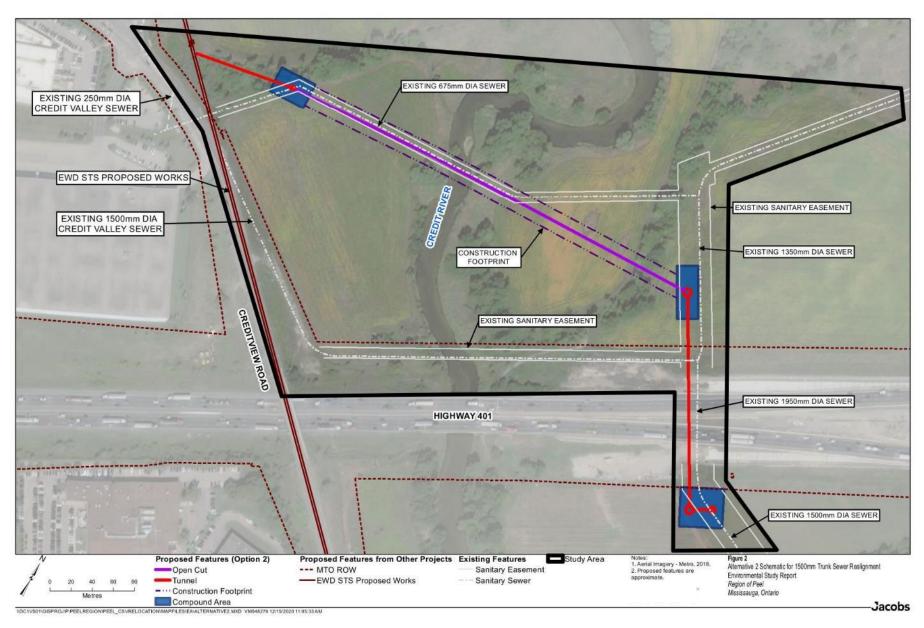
Alternative No. 2: 510 m Open-Cut and 200 m Tunnel for Highway 401 Crossings
